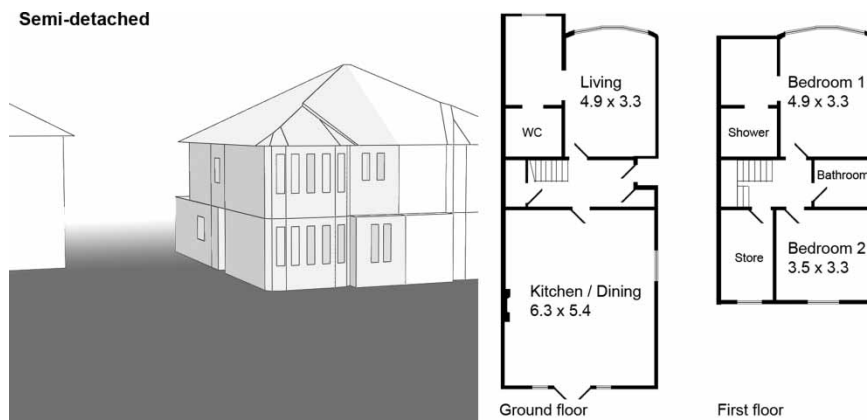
Perspective image, site plan and floor plans of the public transport suburb (PTS) semi-detached home. Source: plans redrawn from Rightmove (2011)
